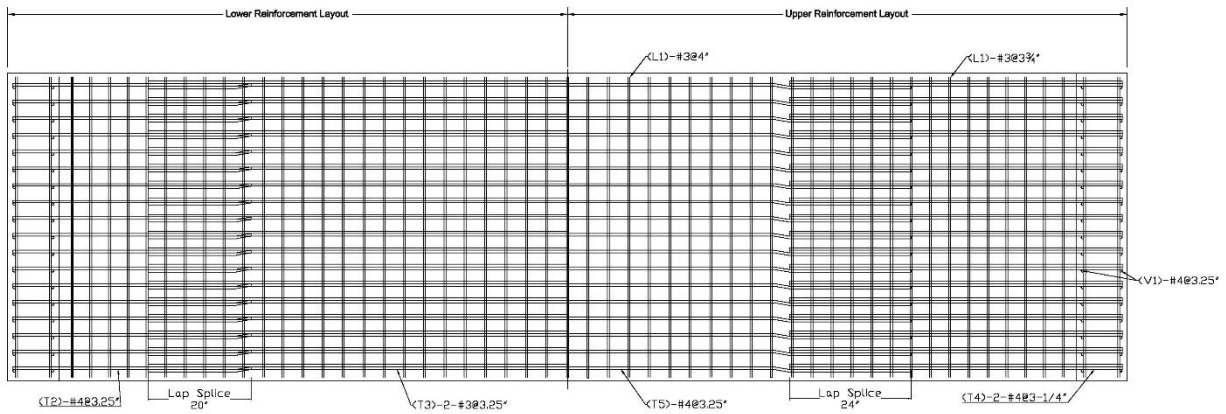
Plan view of rebar layout of lower (left) and upper (right) of roof
